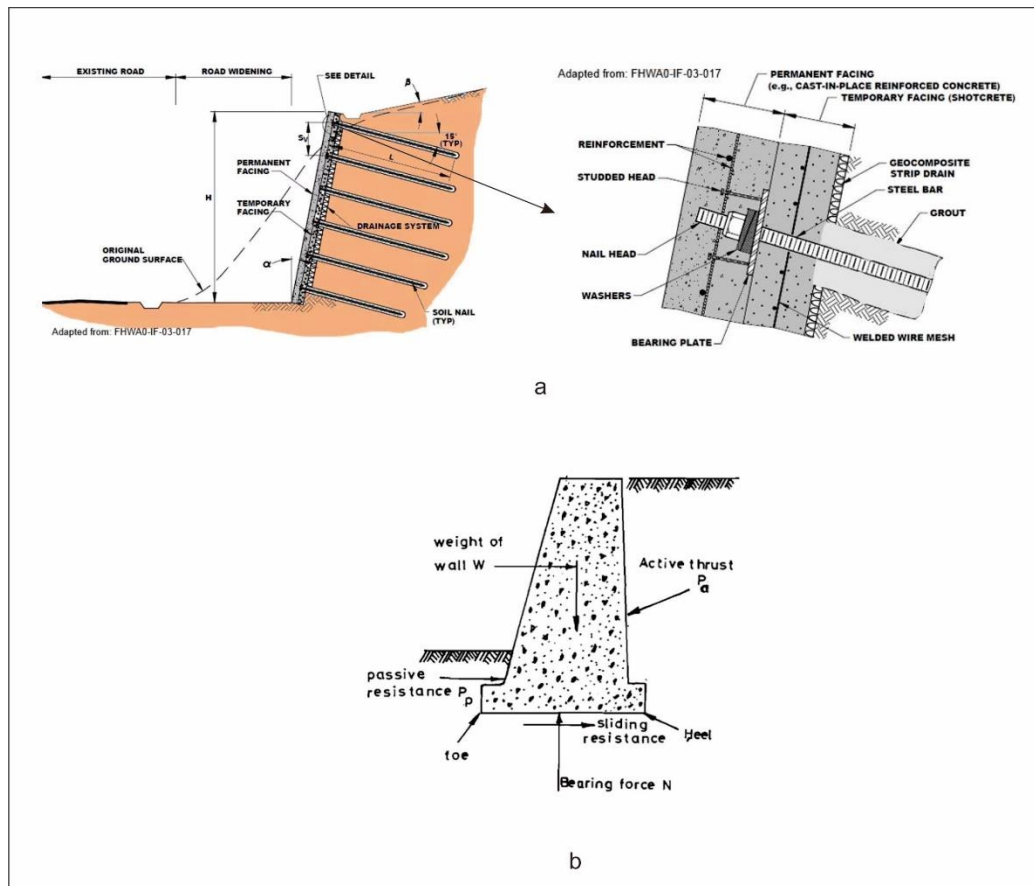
Recommended models that can be applied to the study site slope walls are rockbolt with shotcrete (a) or retaining wall (b).
